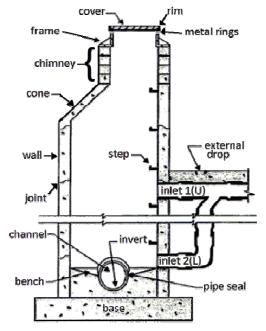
Typical Precast Manhole Cross Section (no scale)
